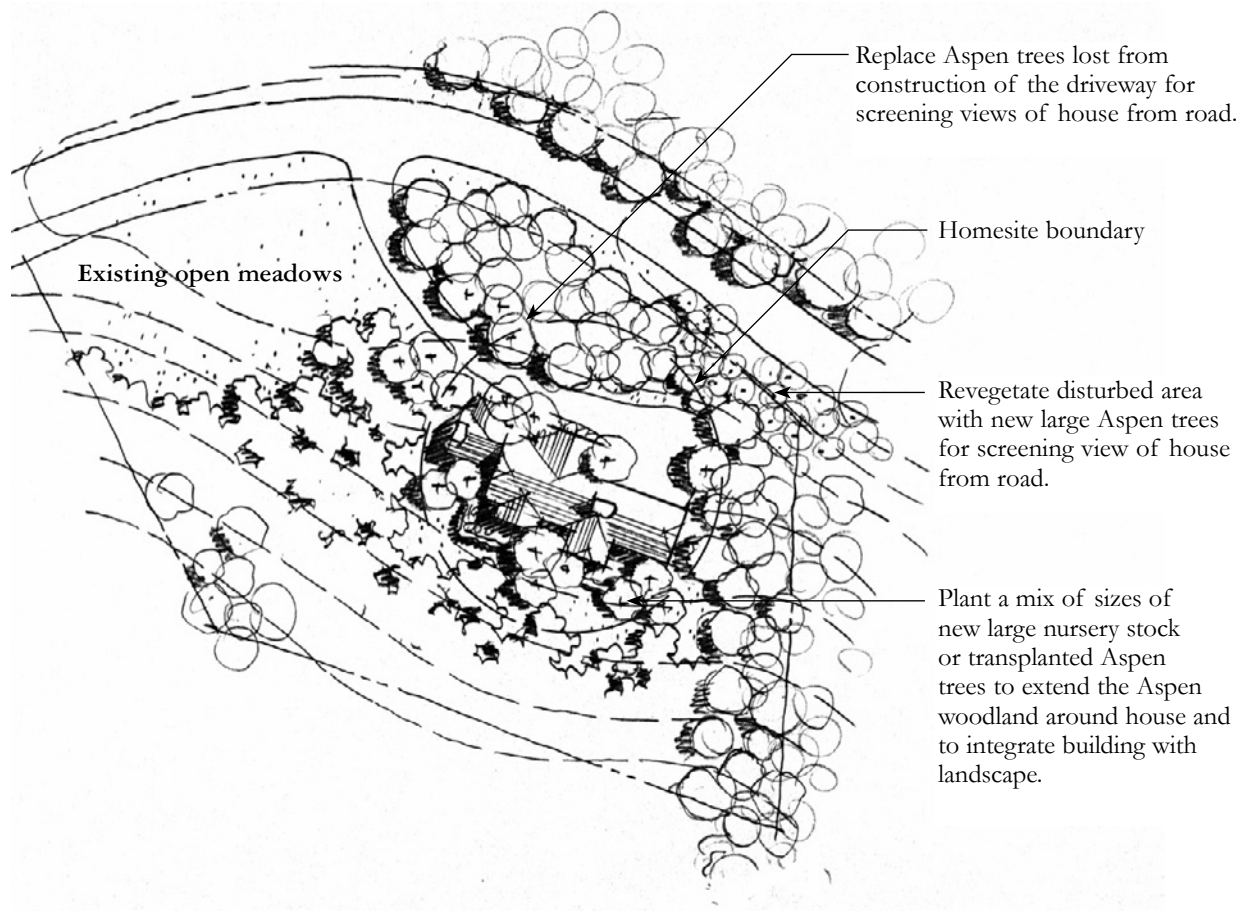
The Meadow Zone - Landscape Planting Diagram
